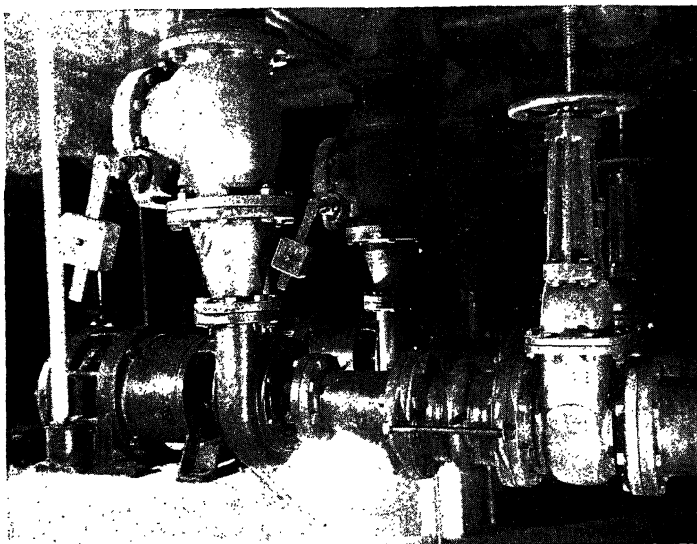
Rubber expansion joint installed in pump suction line to facilitate inspection of pump. (*Courtesy of Burns & McDonnell Engineering Company.*)
